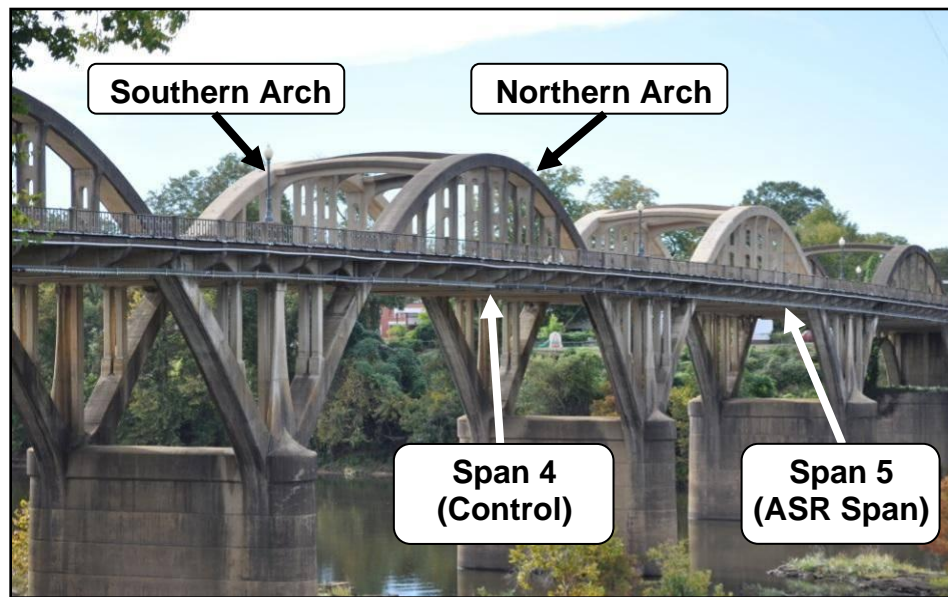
Span 4 and 5 of the Bibb Graves Bridge
